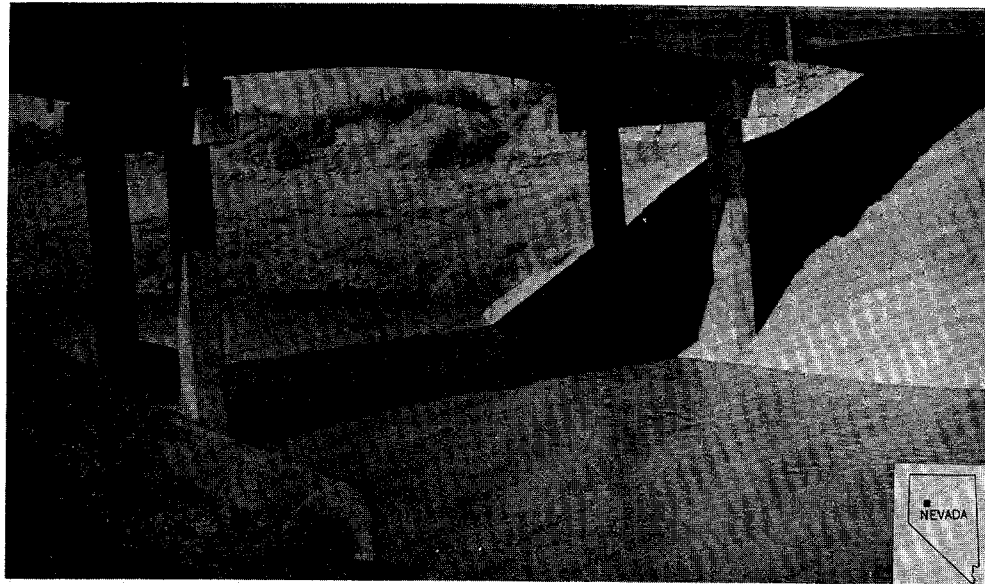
Pavement on abutment slopes on April 17, 1952. (From Nevada Dept. of Highways.)
